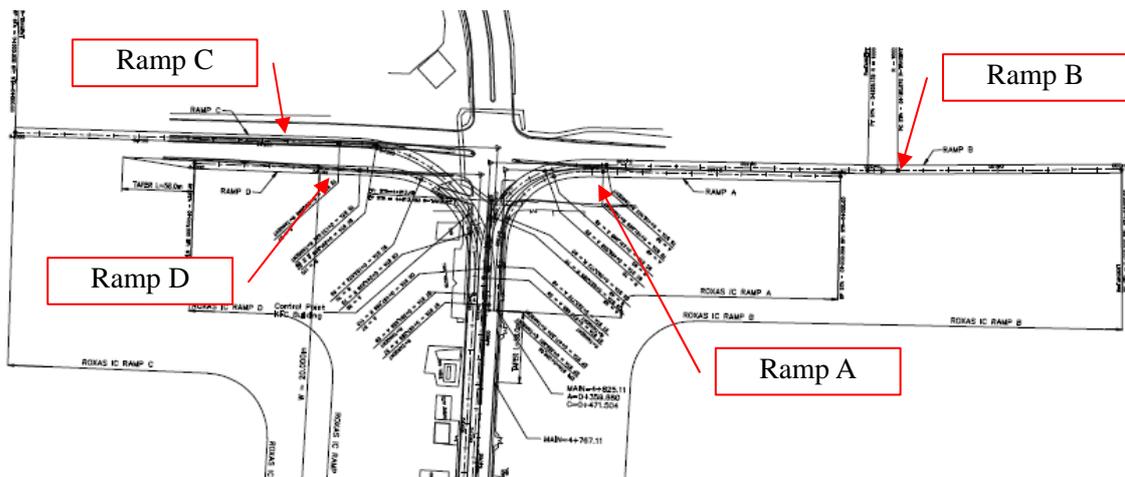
RAMP LAYOUT AT END OF EXPRESSWAY
